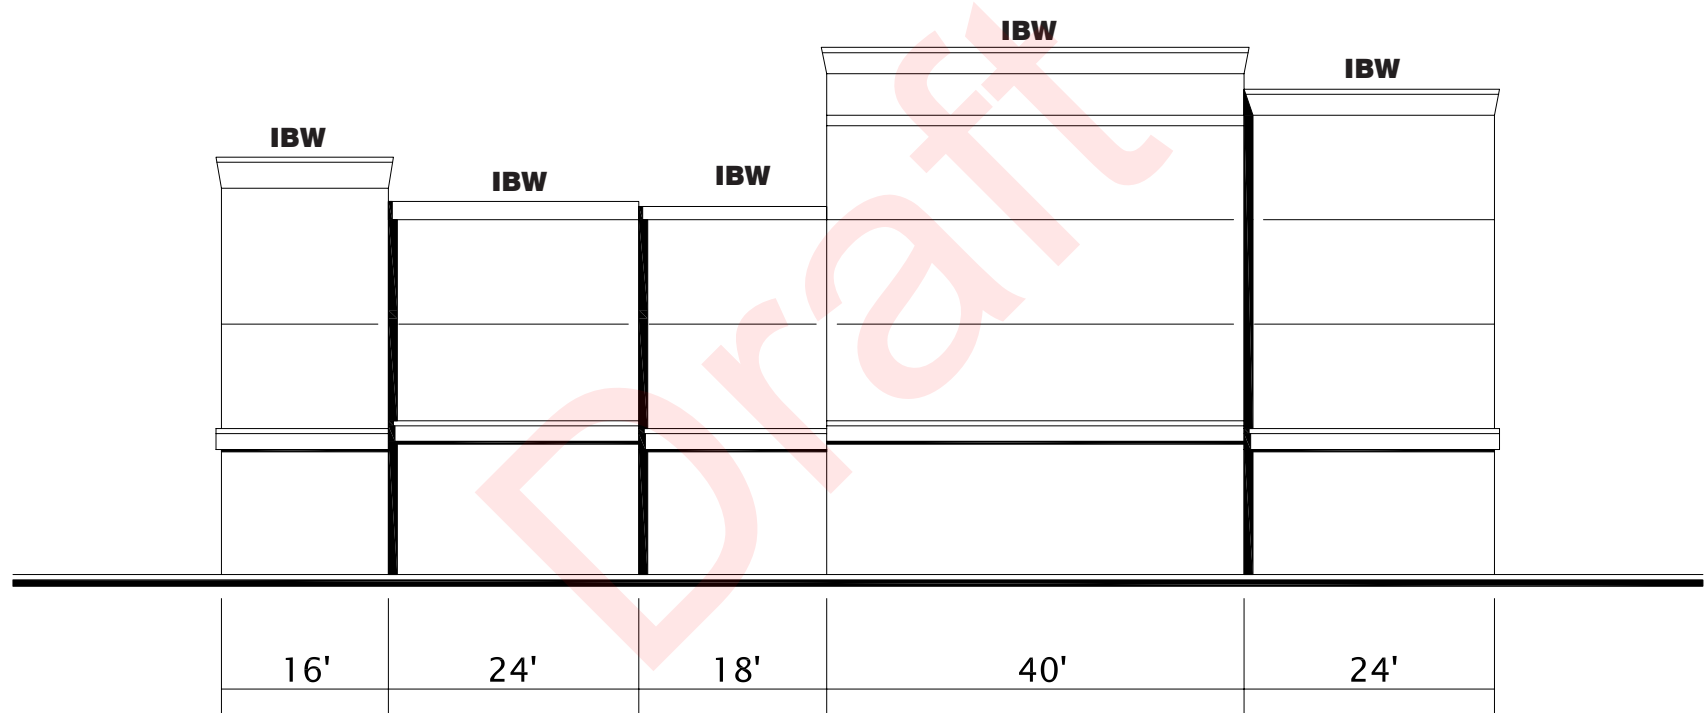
demonstrates a variety of Individual Building Widths and cornice heights which give the street wall an organic look and feel.
